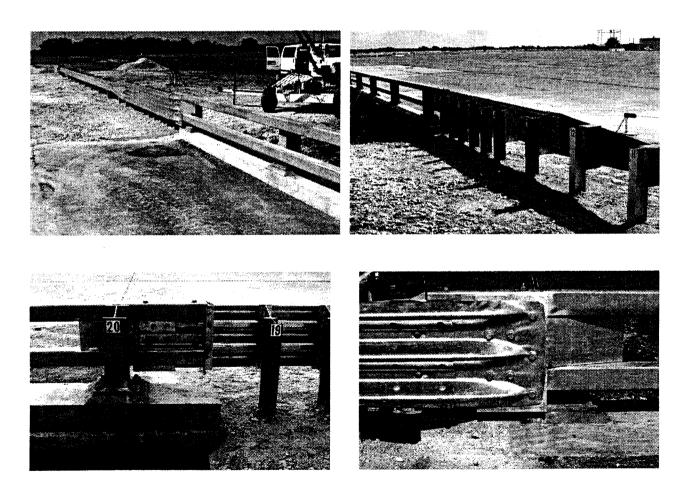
Alaska Multi-State Bridge Rail Thrie-Beam Transition prior to testing.
